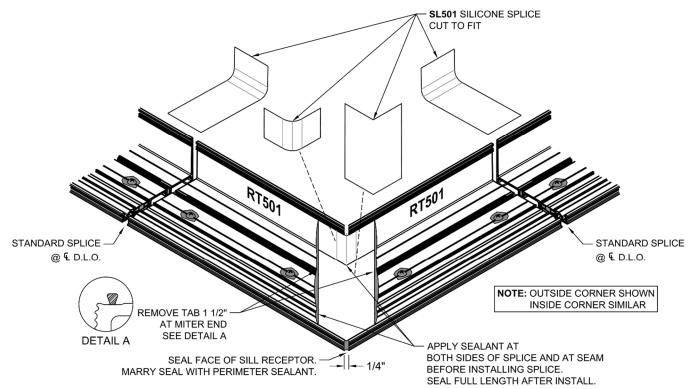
Sill Receptor Splice Installation at Corners (Outside Corner shown, Inside Corner similar)
